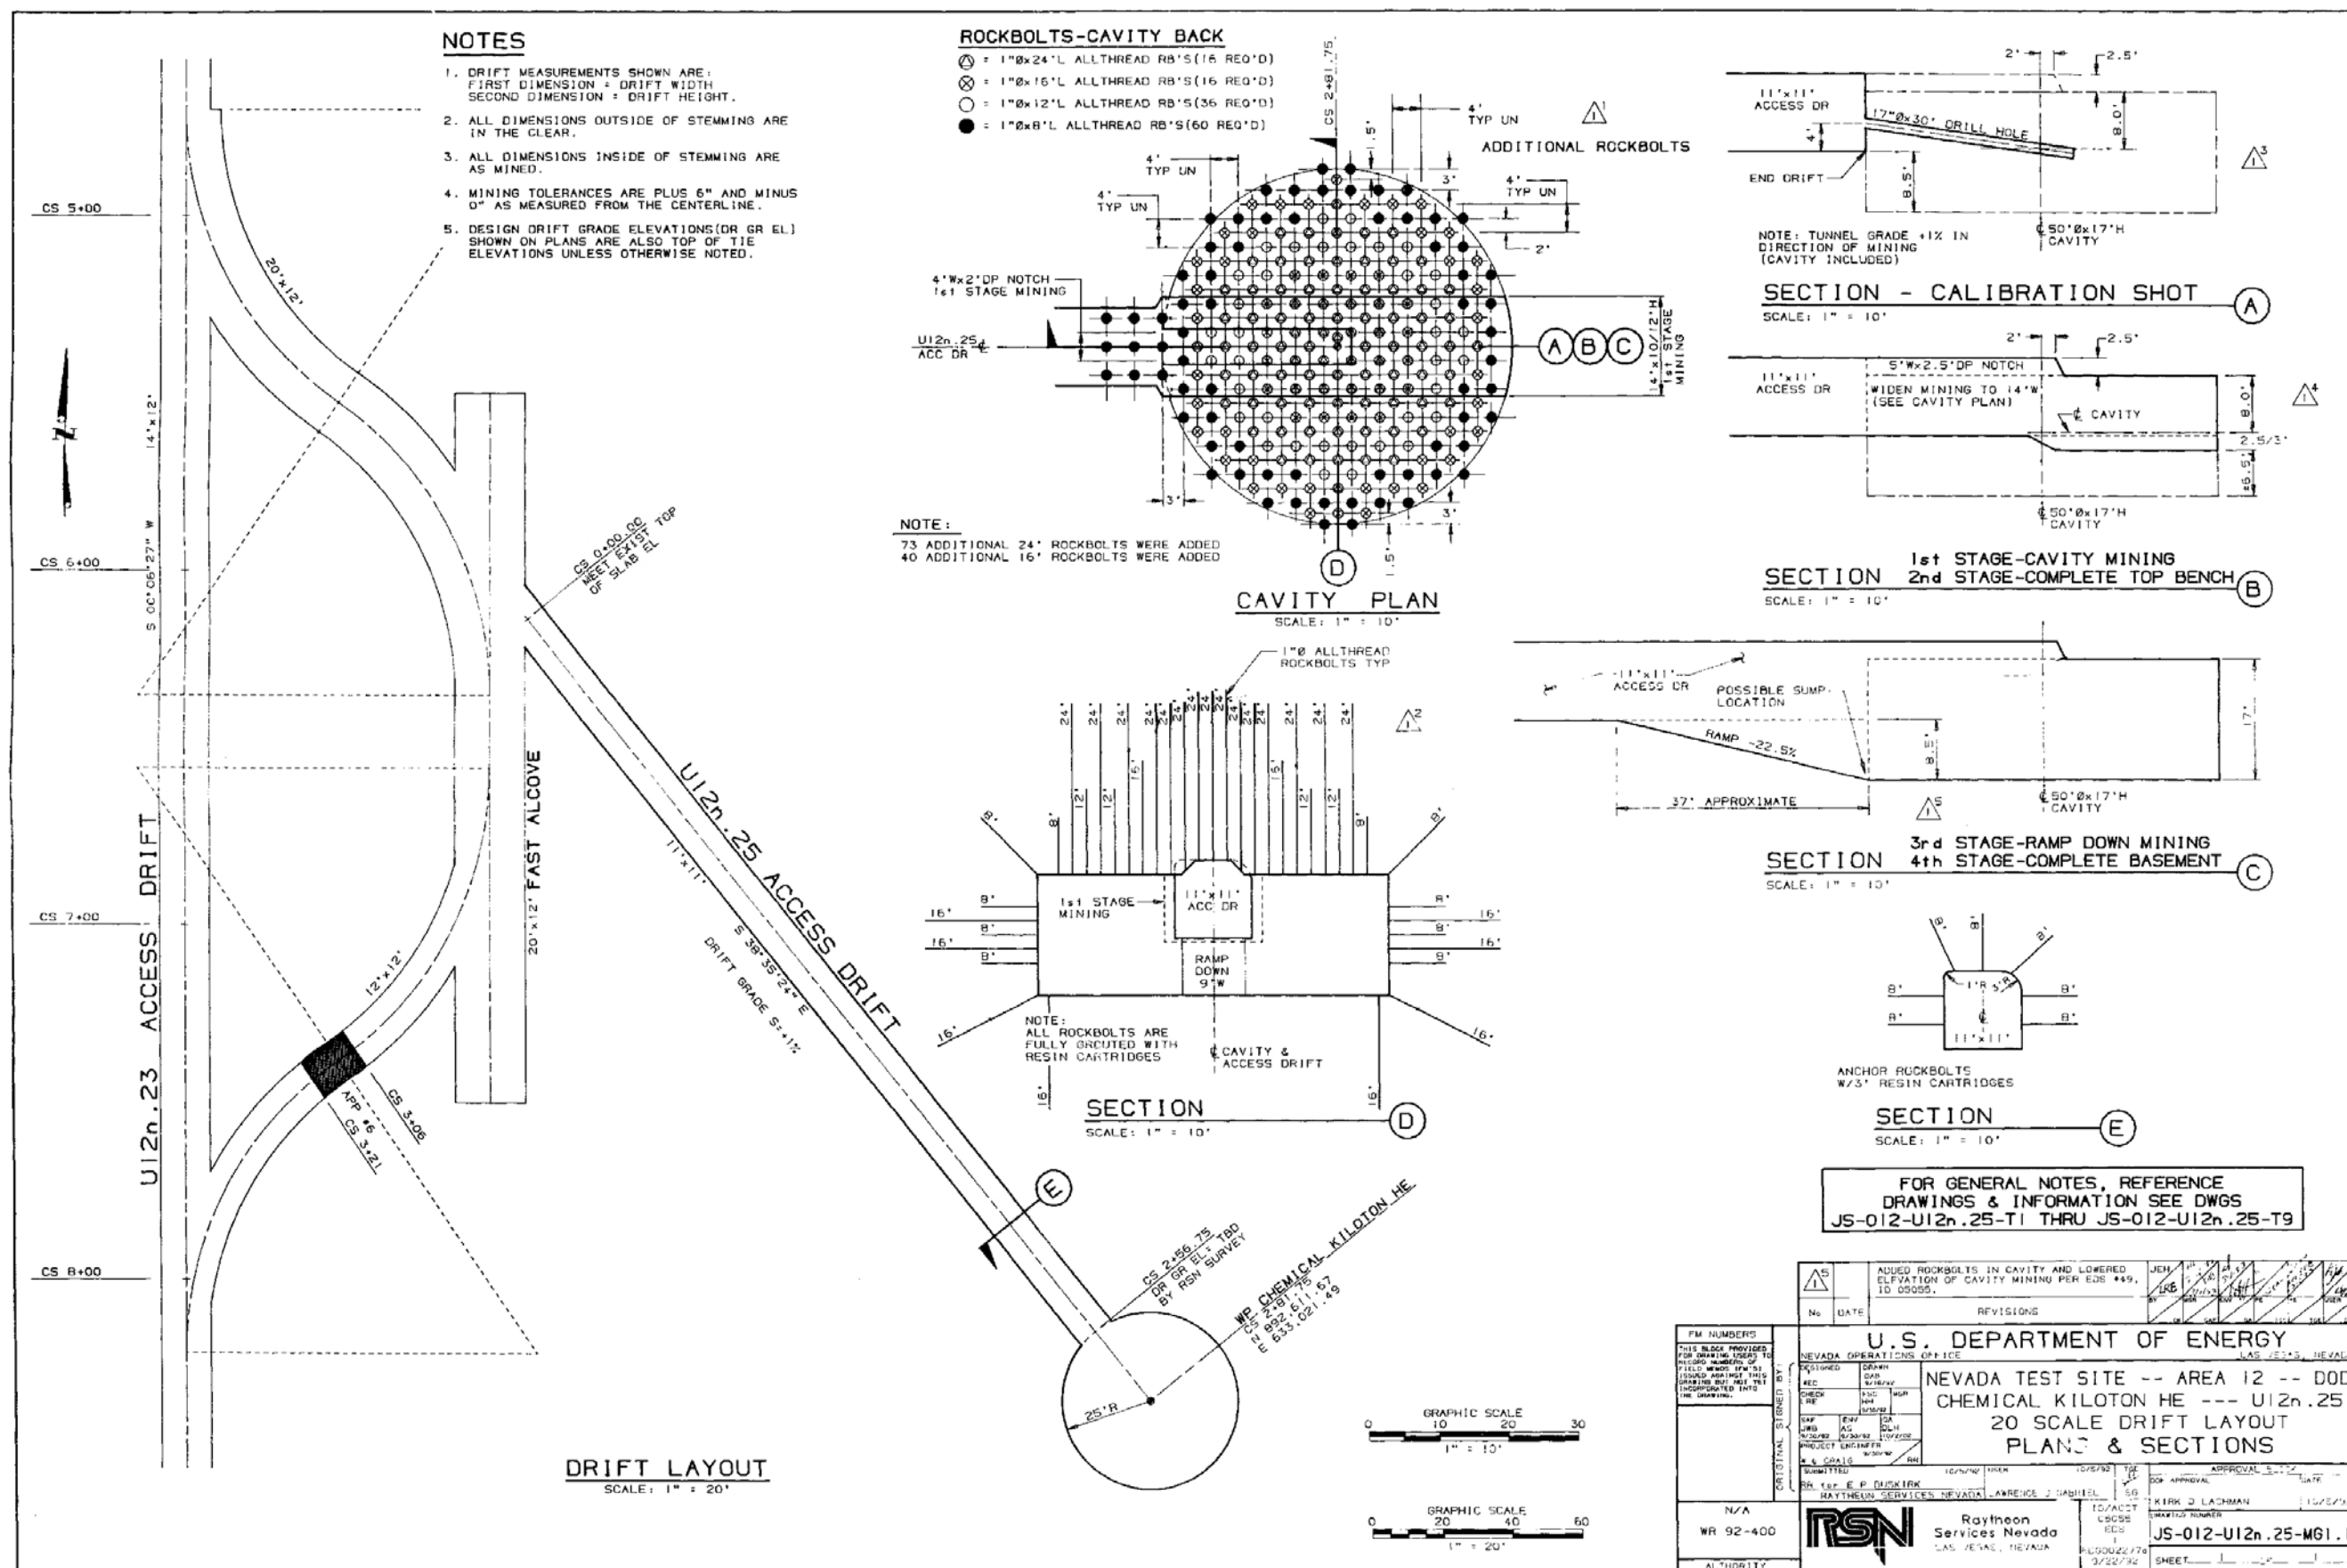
Plans and sections of the U12n.25 drift for the Chemical Kiloton test, 1992 (drawing JS-012-U12n.25-MG1.1, on file at Archives and Records Center, Mercury, Nevada).
